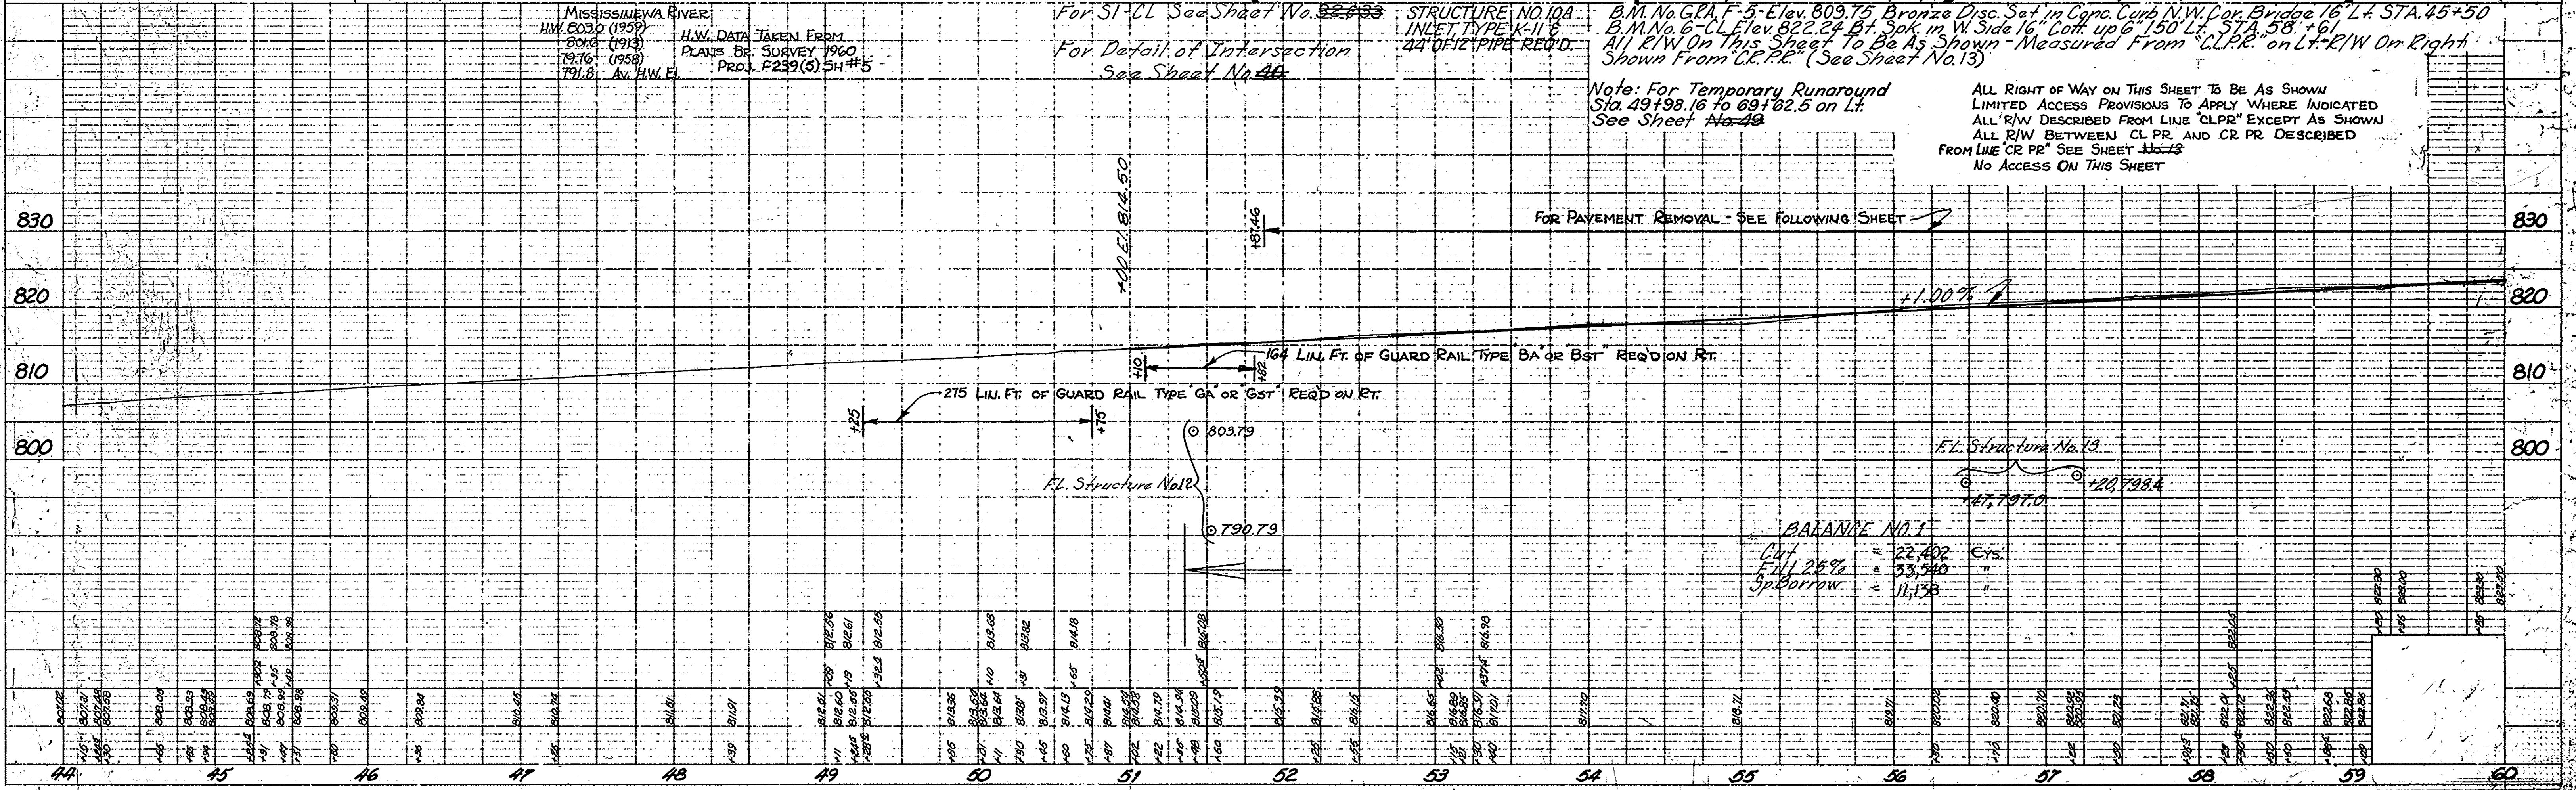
PLAN, PROFILE & R.R. STANDARD
